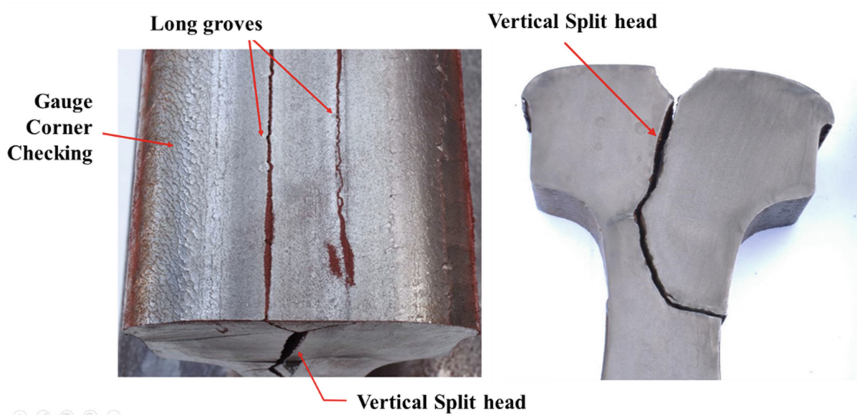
Long grooves, gauge corner checking and vertical split heads present in the fractured rail.
